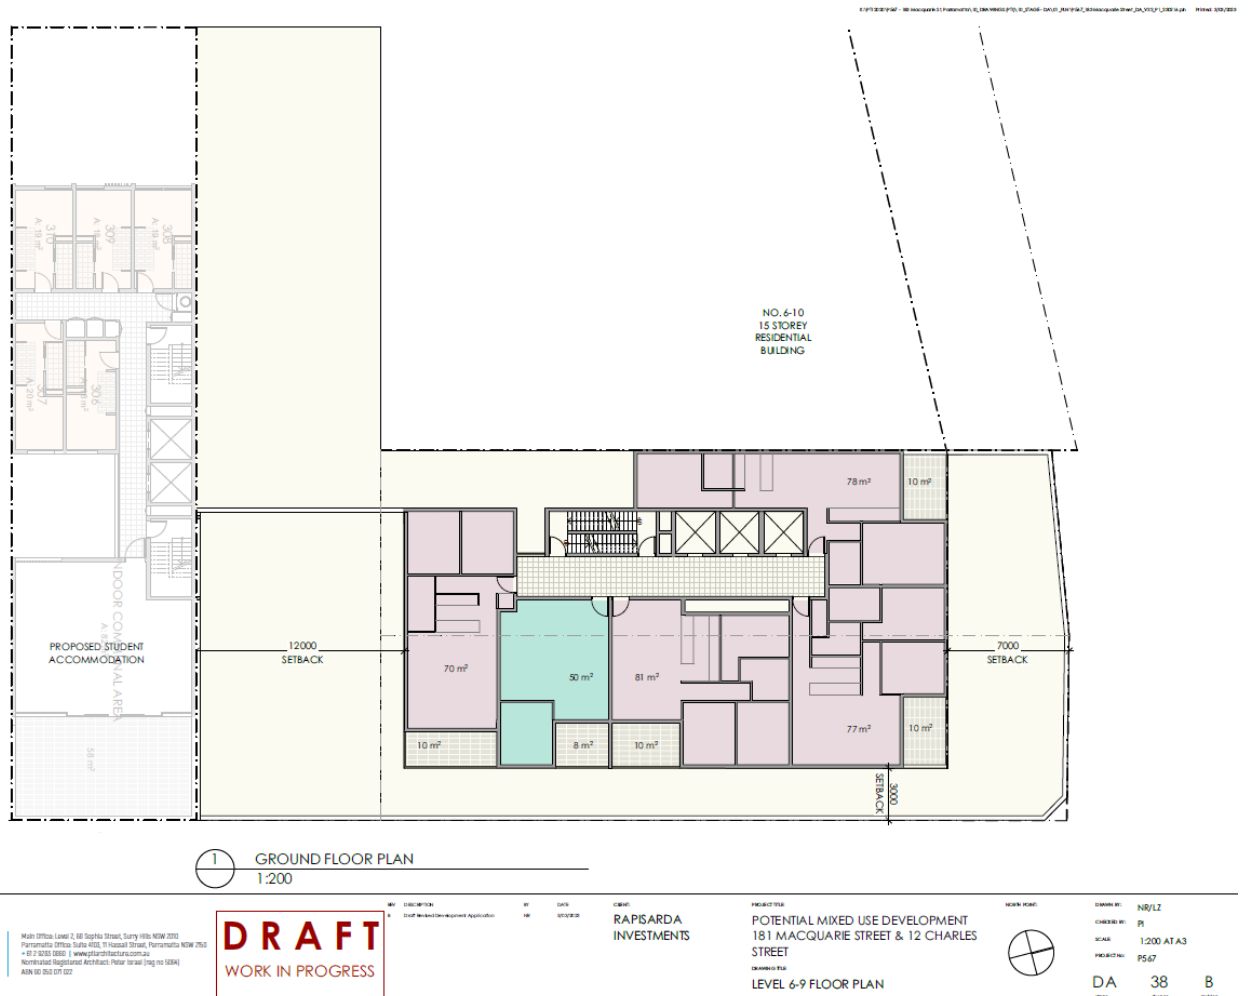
Sample floor plan of concept provided for 12 Charles St property
